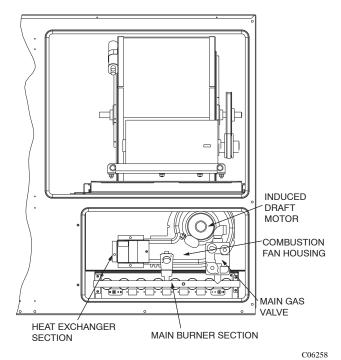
Typical Gas Heating Section (Sizes 08-14 Shown)
